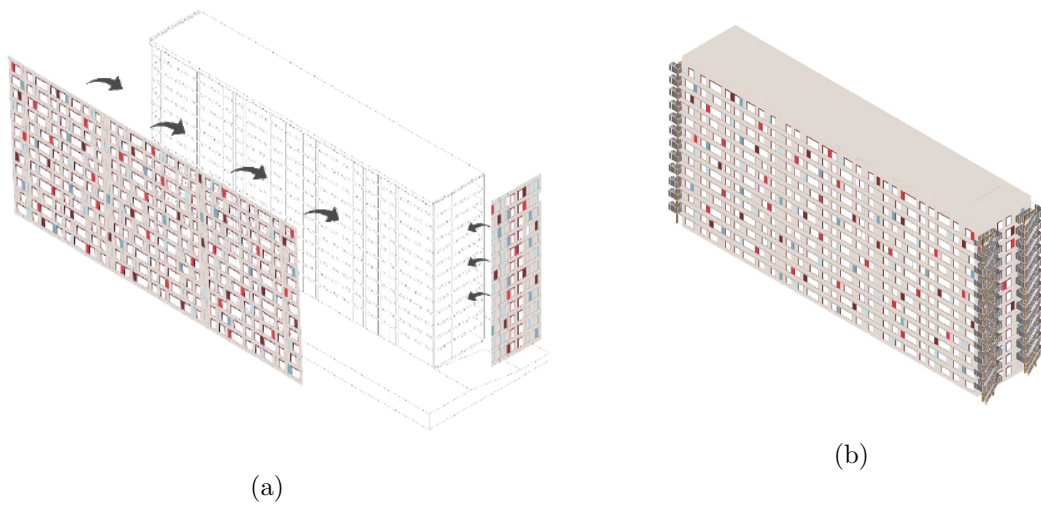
(a) Façade renovation (b) Continuous Balconies and New Staircases [15]
